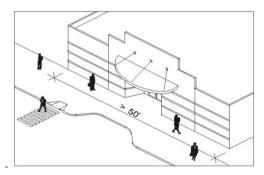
(B): Recessed building entrance provides a relief to a facade.
